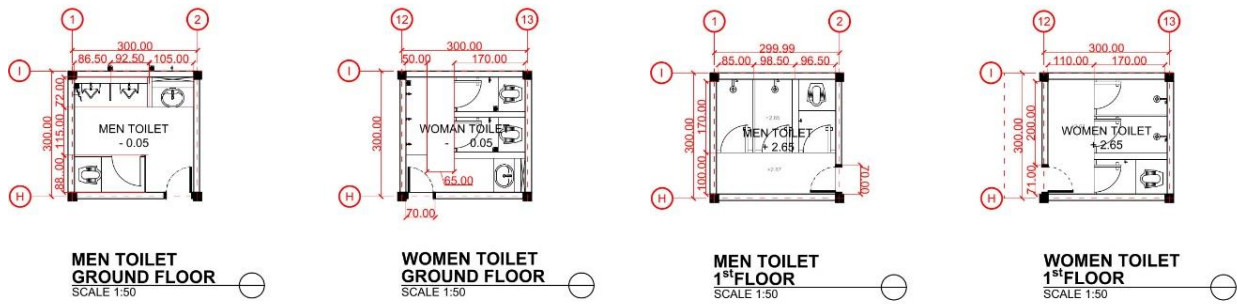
Layout of the toilets in GF and 1<sup>st</sup> floor
